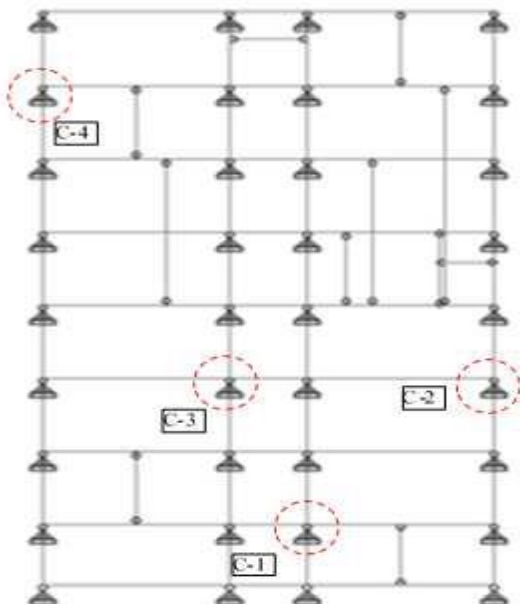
Plan view of Block-A, Jamshedpur Hospital Building (G+4)
